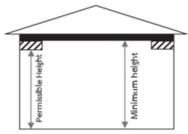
Height Measurement of meeting room with beams or structures lower than the ceiling.
